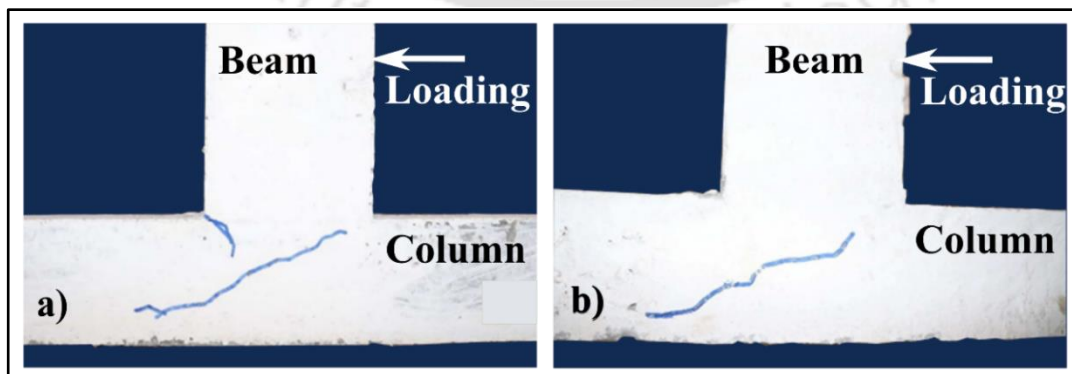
Crack pattern and failure mechanism of specimens: a) S-A, and b) S-B
